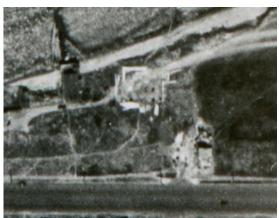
1935 aerial view of the site of 702 Earl Street, as construction was just underway; the site is cleared. Upper left is north.
